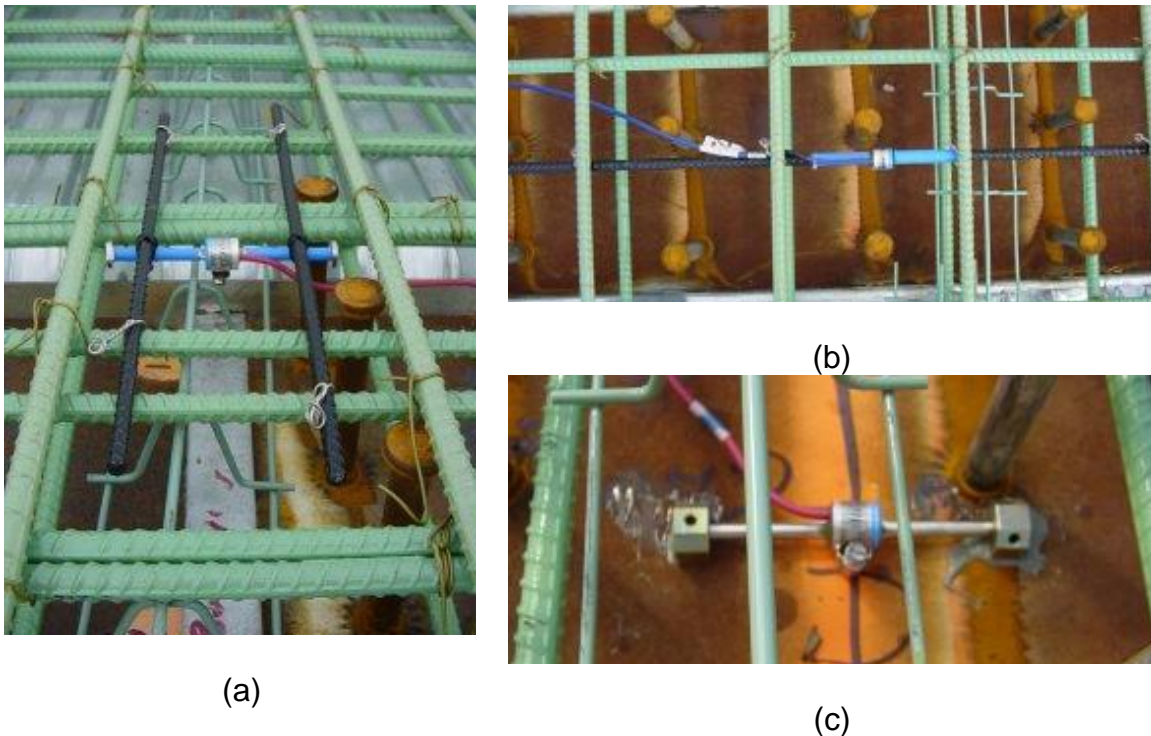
(a) Standard 4-in. VWSG, (b) sister-rebar, and (c) weldable VWSG
